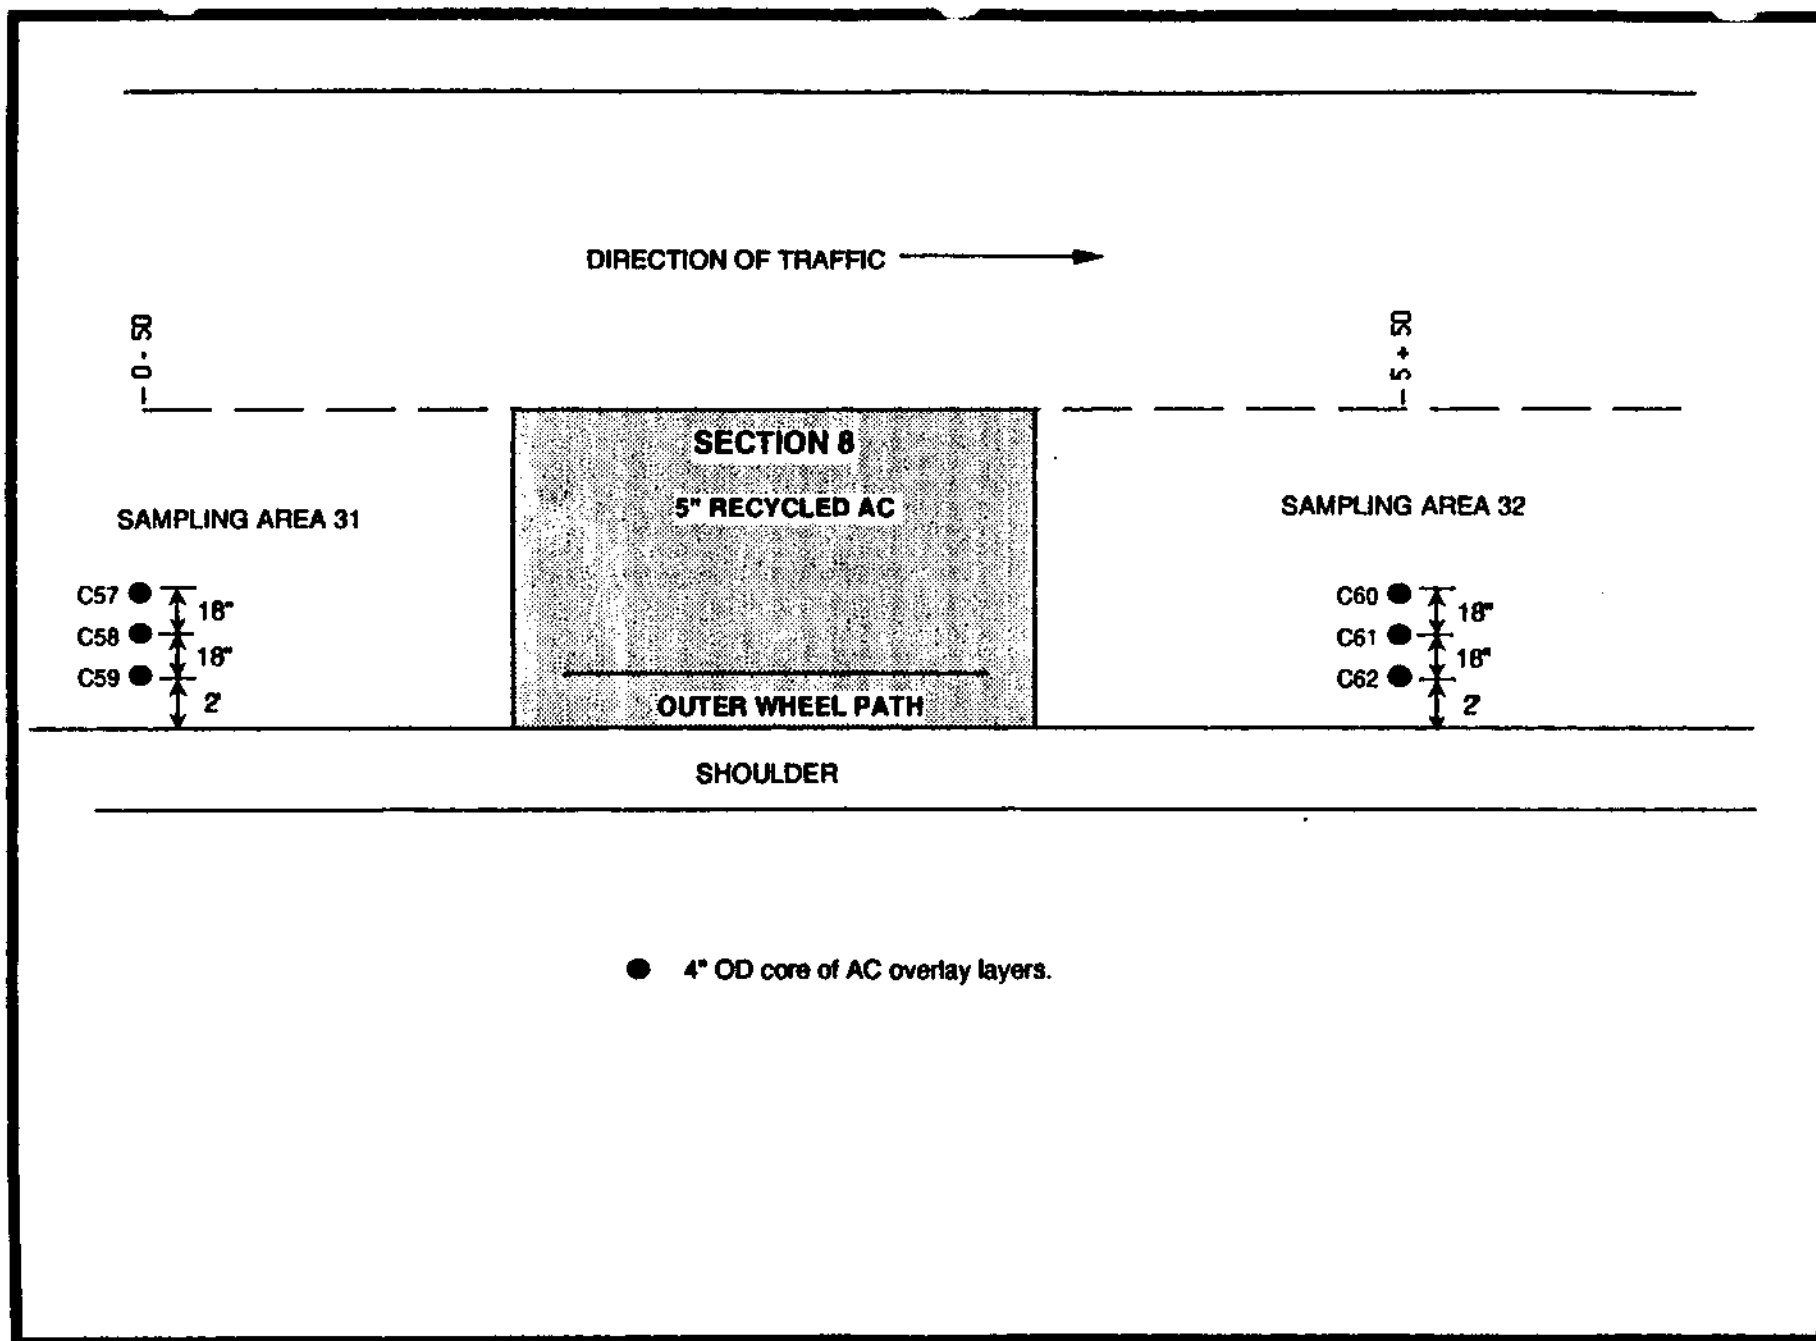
Example of "Post-Construction" Sampling Plan for Section 8.
